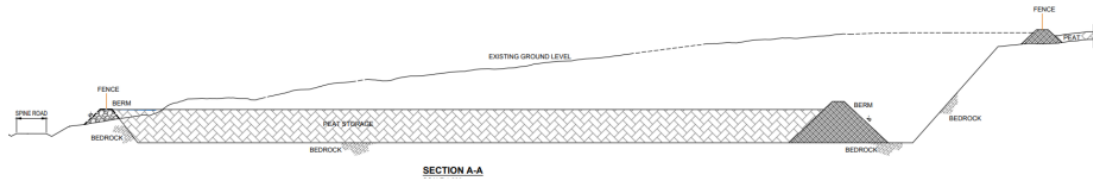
Cross Section of Borrow Pit South of Turbine 12
